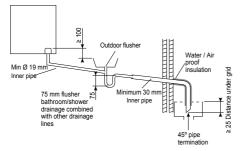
Connection of Condensate Drainage to Rain Drainage Line through Sink, Bathtub or Shower Drainage Pipe
